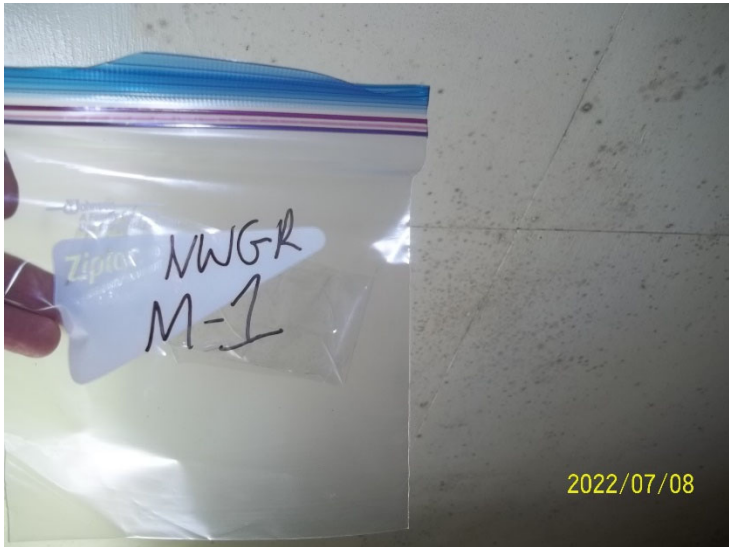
View of mould sample NWGR M-1, ceiling, cabin interior.
